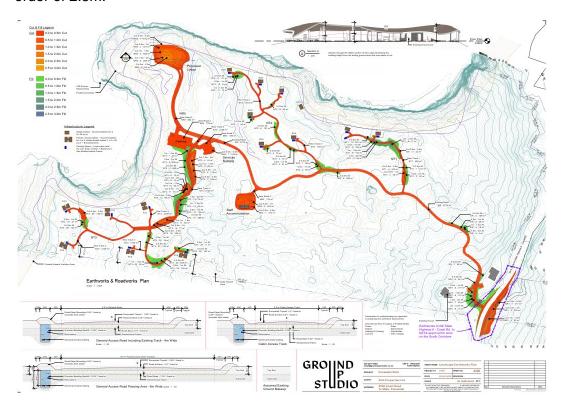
Landscape Earthworks Plan (Ground Up Studio)
